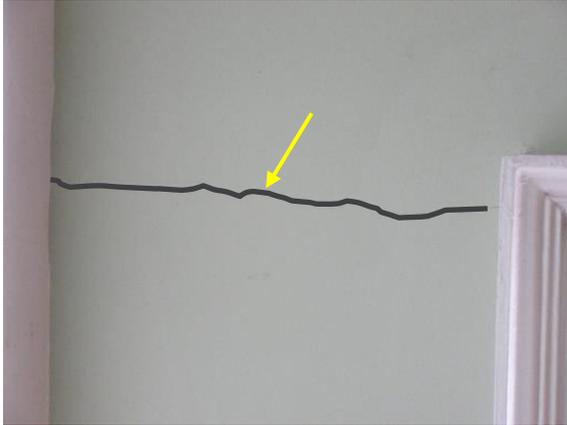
Hairline cracking in plaster adjacent to door frame (crack traced for clarity).
